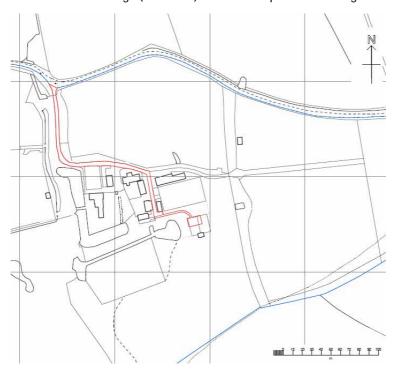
Site Boundary and Existing Access Track (red line) and Wider Landholdings (blue line)
